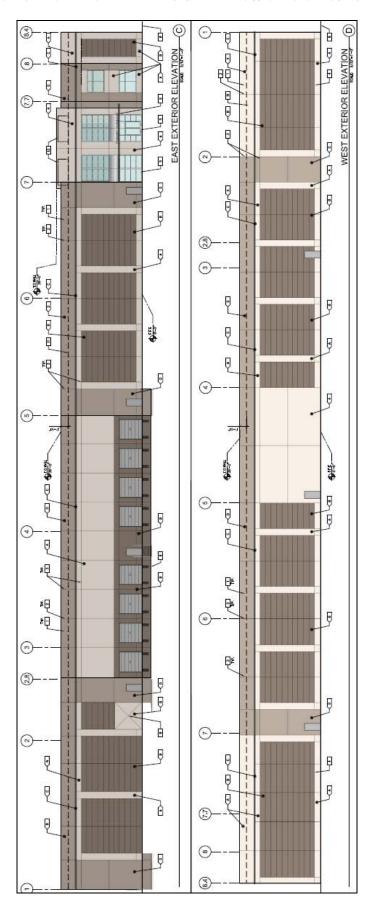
CONCEPTUAL BUILDING ELEVATIONS SOURCE: WARE MALCOMB
